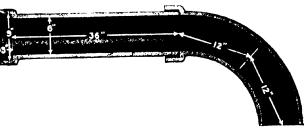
, ACID PROOF TROUGH OR SPLIT PIPE
